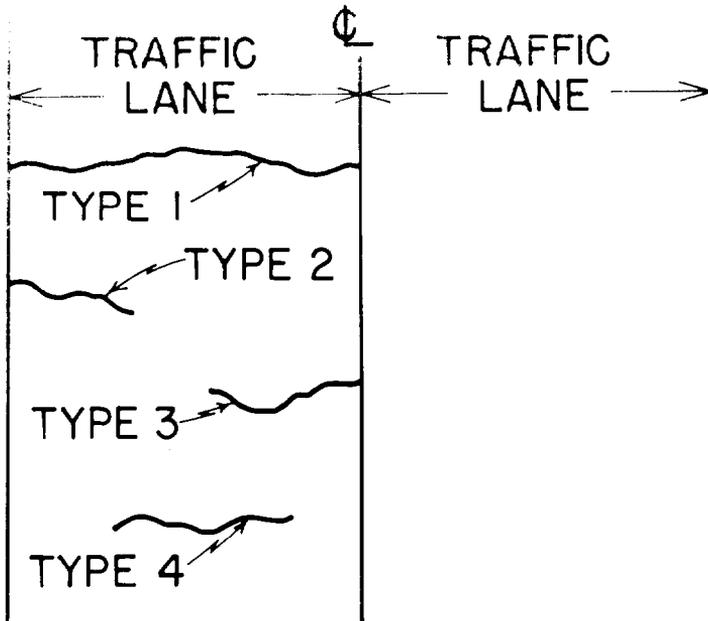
TYPES OF TRANSVERSE PAVEMENT CRACKS.
